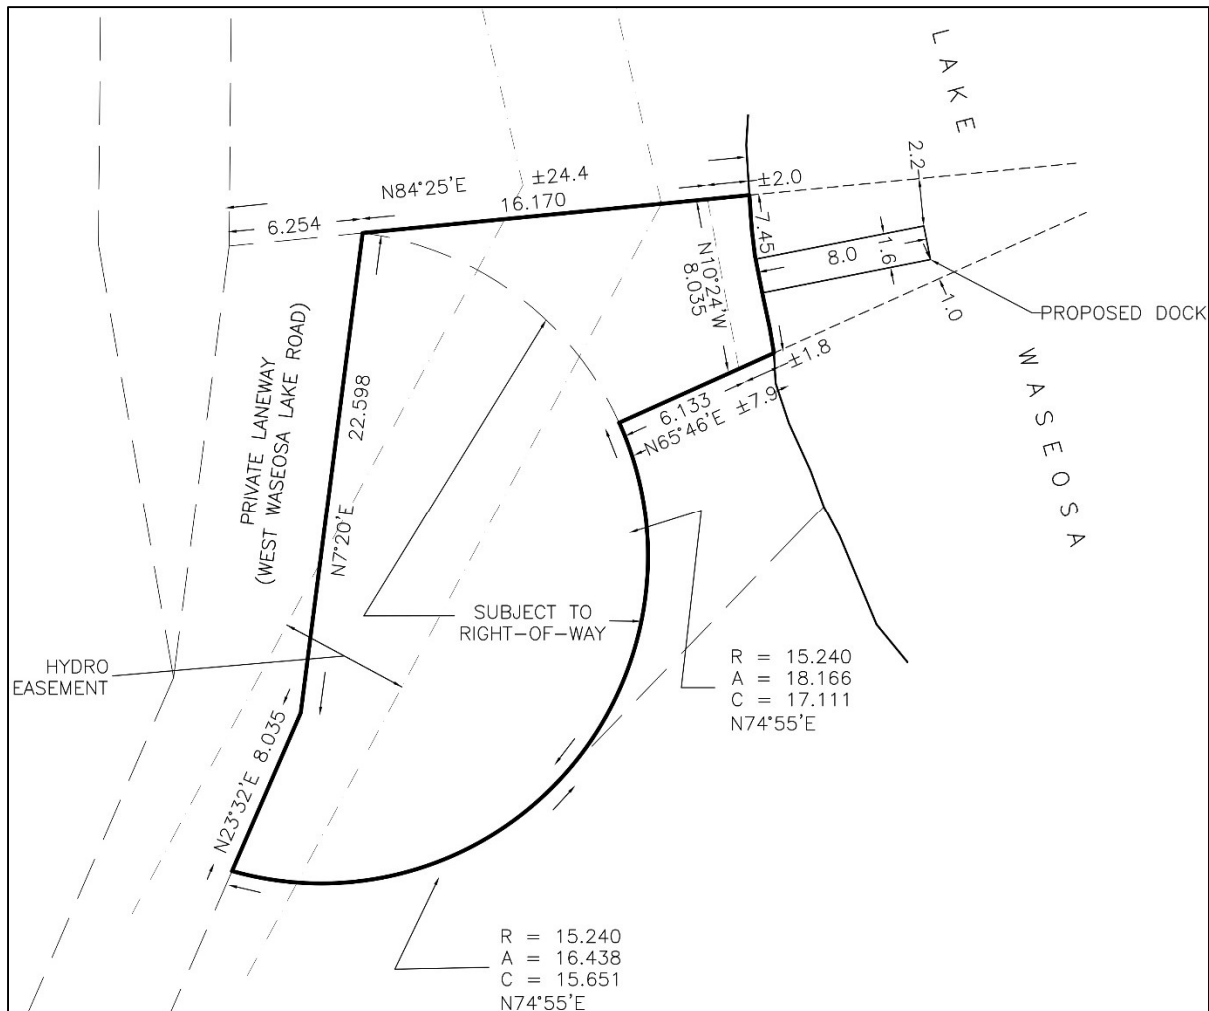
Site Plan Sketch Showing Side-yard Setback Compliance Issues (Plan Muskoka)
